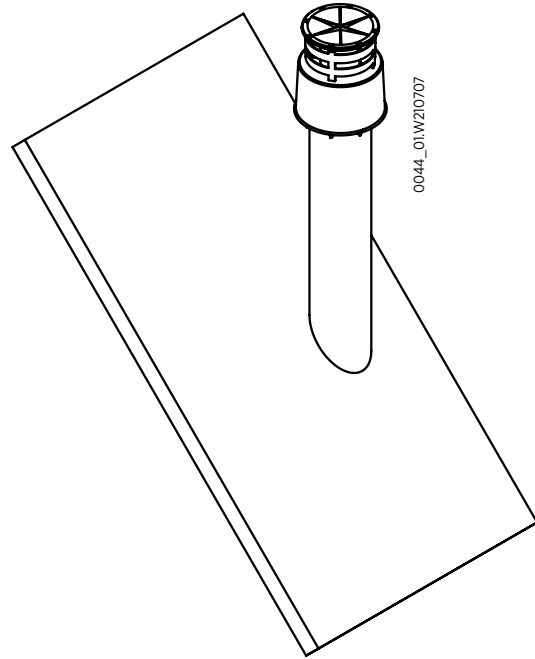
Waste gas vertical outlet chimney set and Pitched Roof Outlet Tile part installation for Roof
